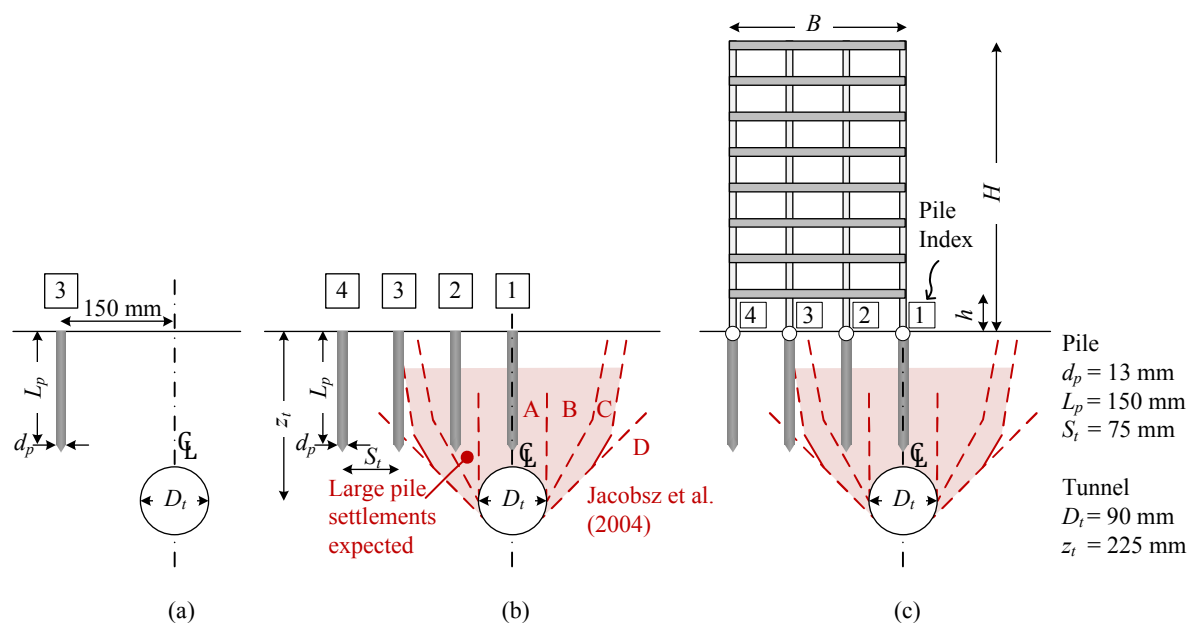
Test layout (in model scale): (a) loading tests, (b) tunnelling beneath a single pile, and (c) tunnelling beneath a piled frame (the geotechnical domain is modelled in the centrifuge, whereas the frame is modelled numerically).
